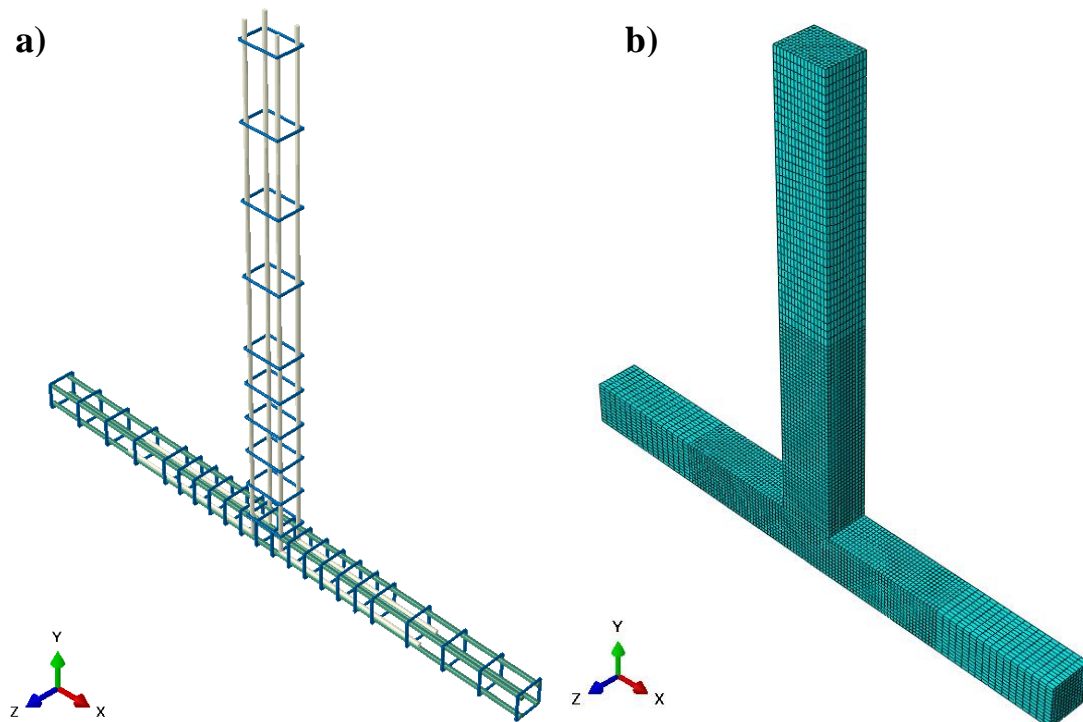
a) Reinforcement detailing, and b) Finite element mesh of the beam-column subassembly
